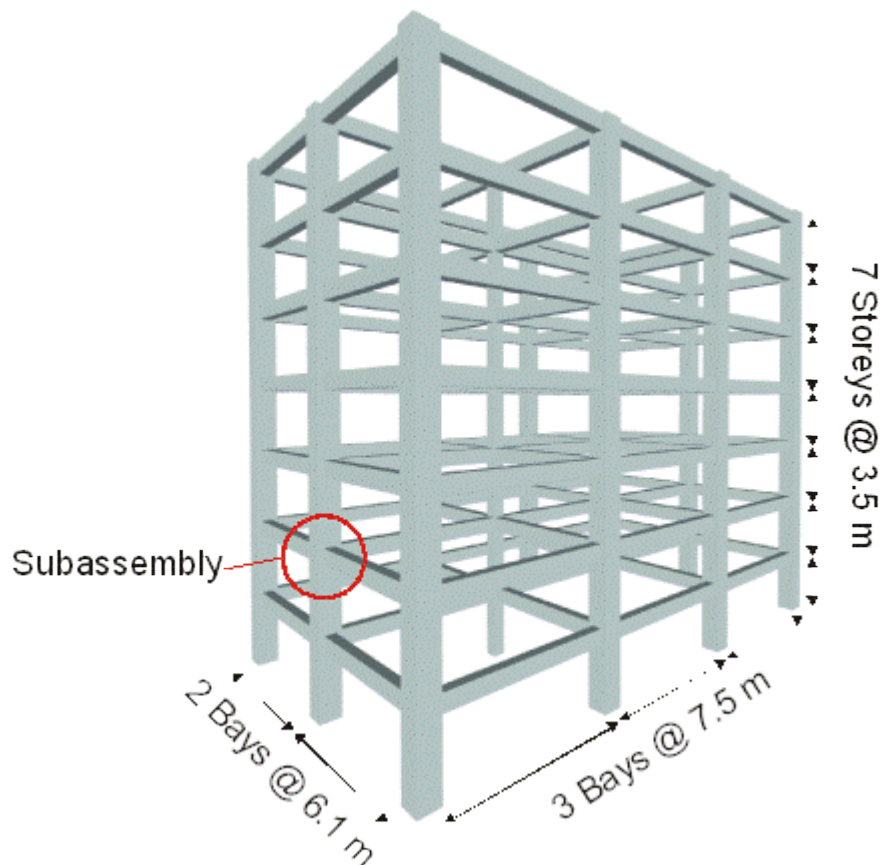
Prototype building from which test specimens were taken. Adapted from Muir, Bull & Pampanin (2010)
